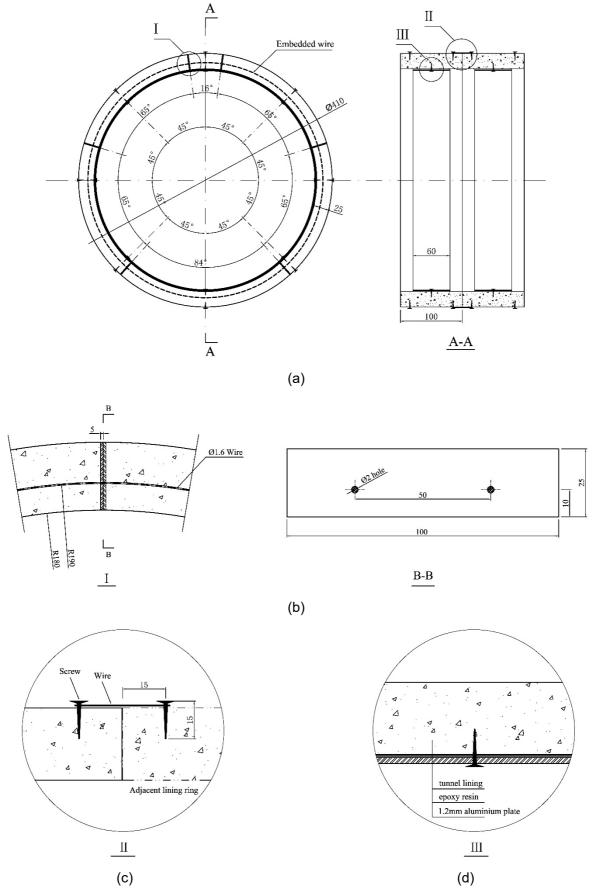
Detailed drawings of the segmental tunnel lining model (unit: mm), (a) An overall drawing
